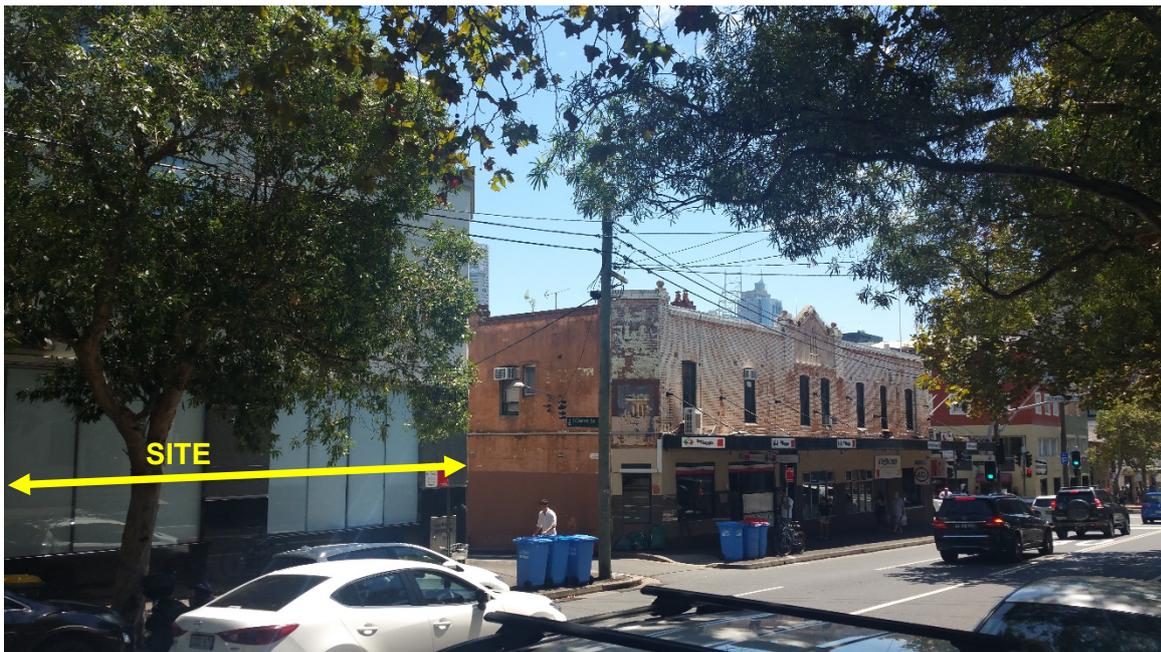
Site viewed from Crown Street with adjoining properties to the north
